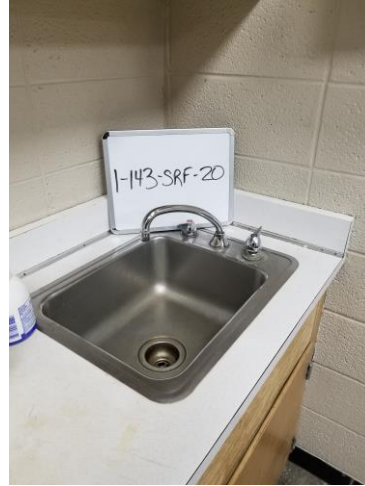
Staff room faucet, located on the 1st floor in room 143.
